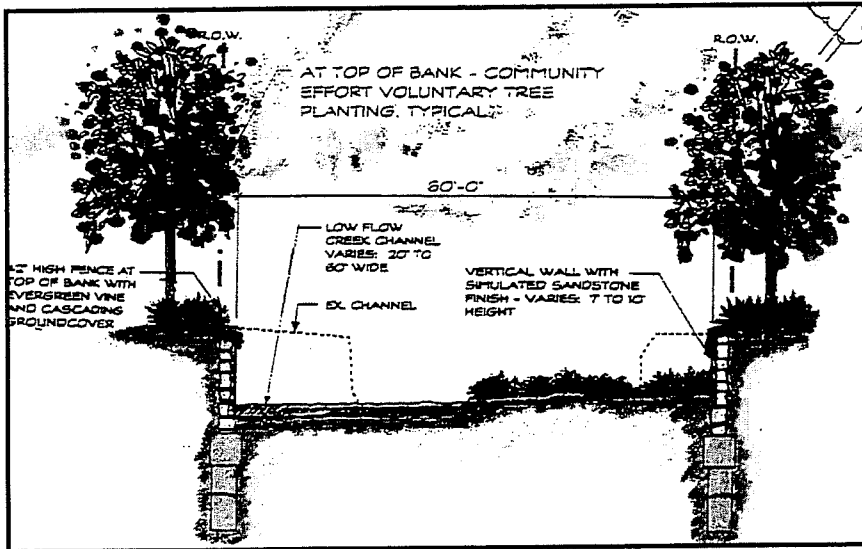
Vertical Wall on Pier Footing Representative Cross Section
